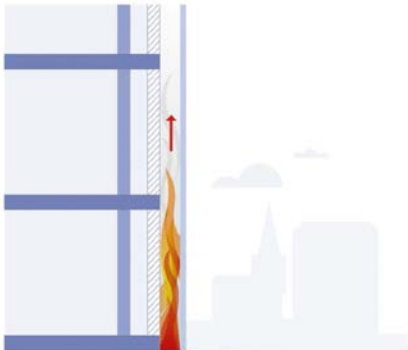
Exterior wall and floor fire exposure mechanisms from a fire starting in the cavity of a facade system (Courtesy of Arup)
